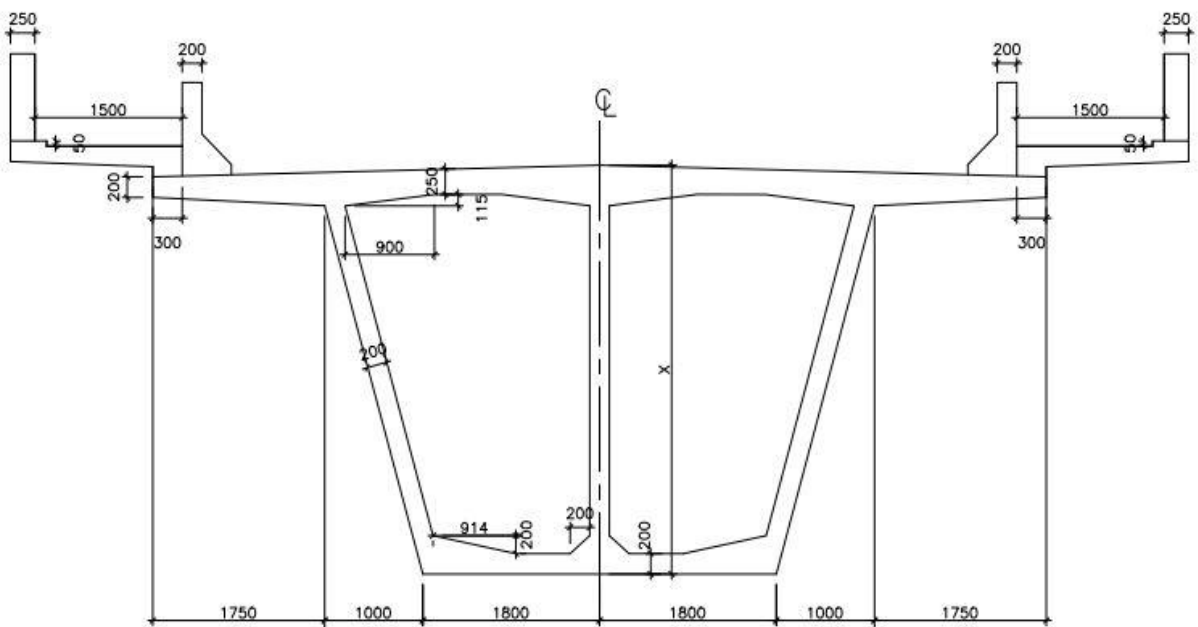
CROSS SECTION OF MULTI CELL BOX GIRDER
